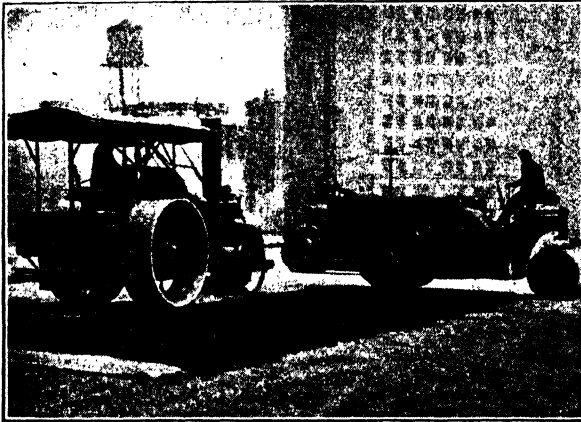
Three-wheel and tandem rollers on asphalt-pavement construction.
